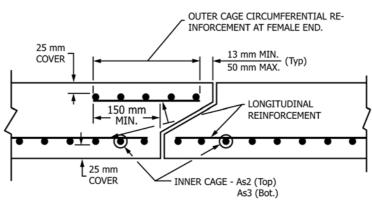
Section A-A Top and Bottom Slab Joint Reinforcement
